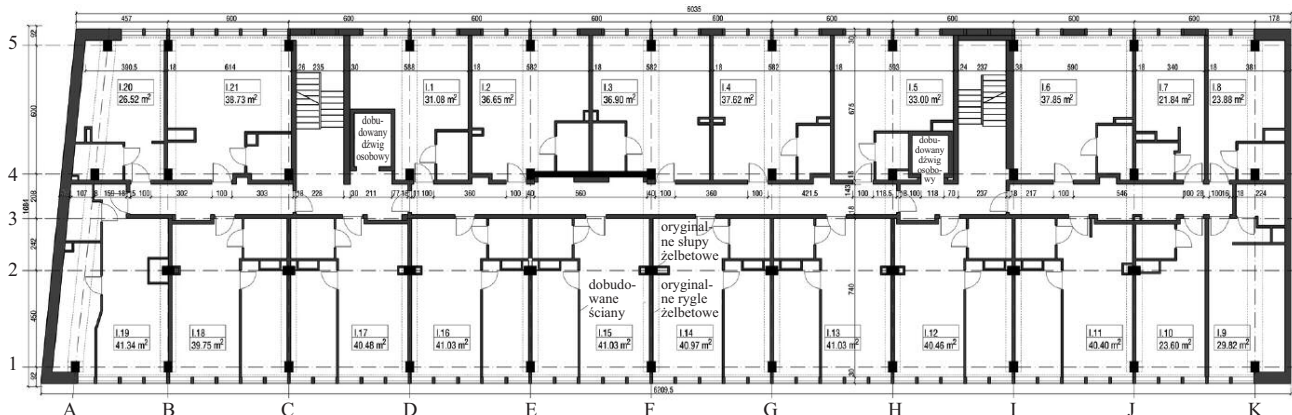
Layout of the rooms (according to the design project [32]) of the second storey above the new ribbed floor slab
